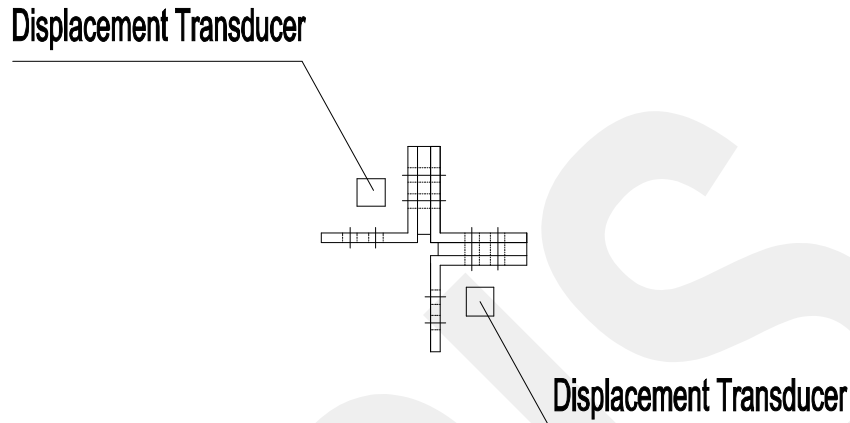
Displacement transducer locations in cross-sectional view (Specimen-7)
